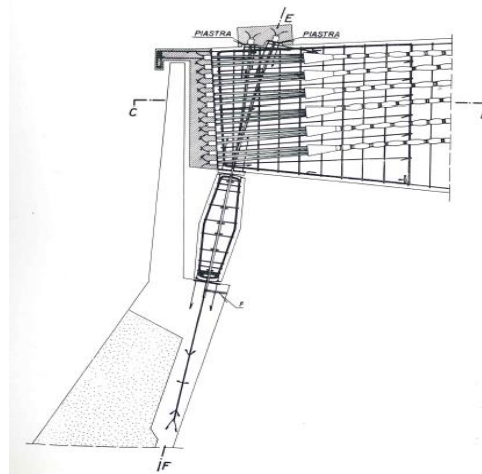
Construction detail of the shorter strut beam connection with rib and retaining wall (Boaga, 1984)
